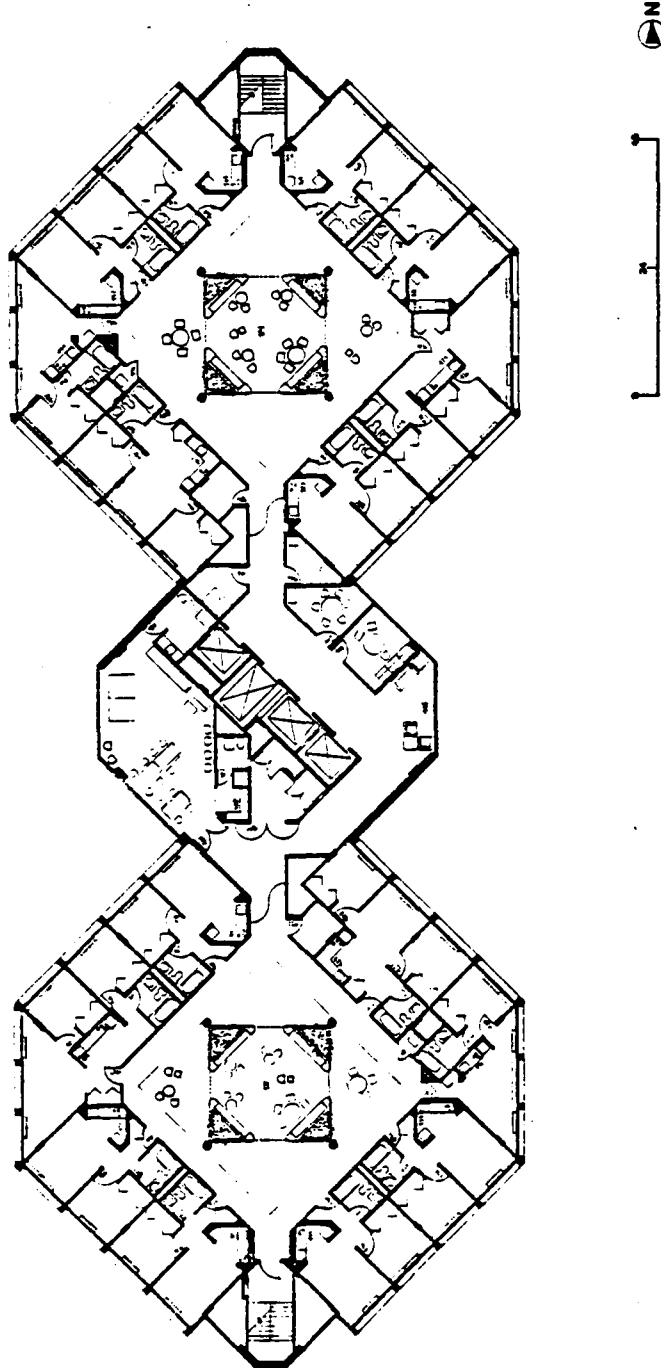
Apartment floor plan, Johnston R. Bowman Center.
